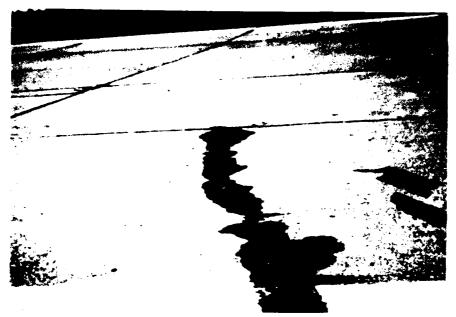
Medium severity transverse crack, jointed rigid pavement, case 1
